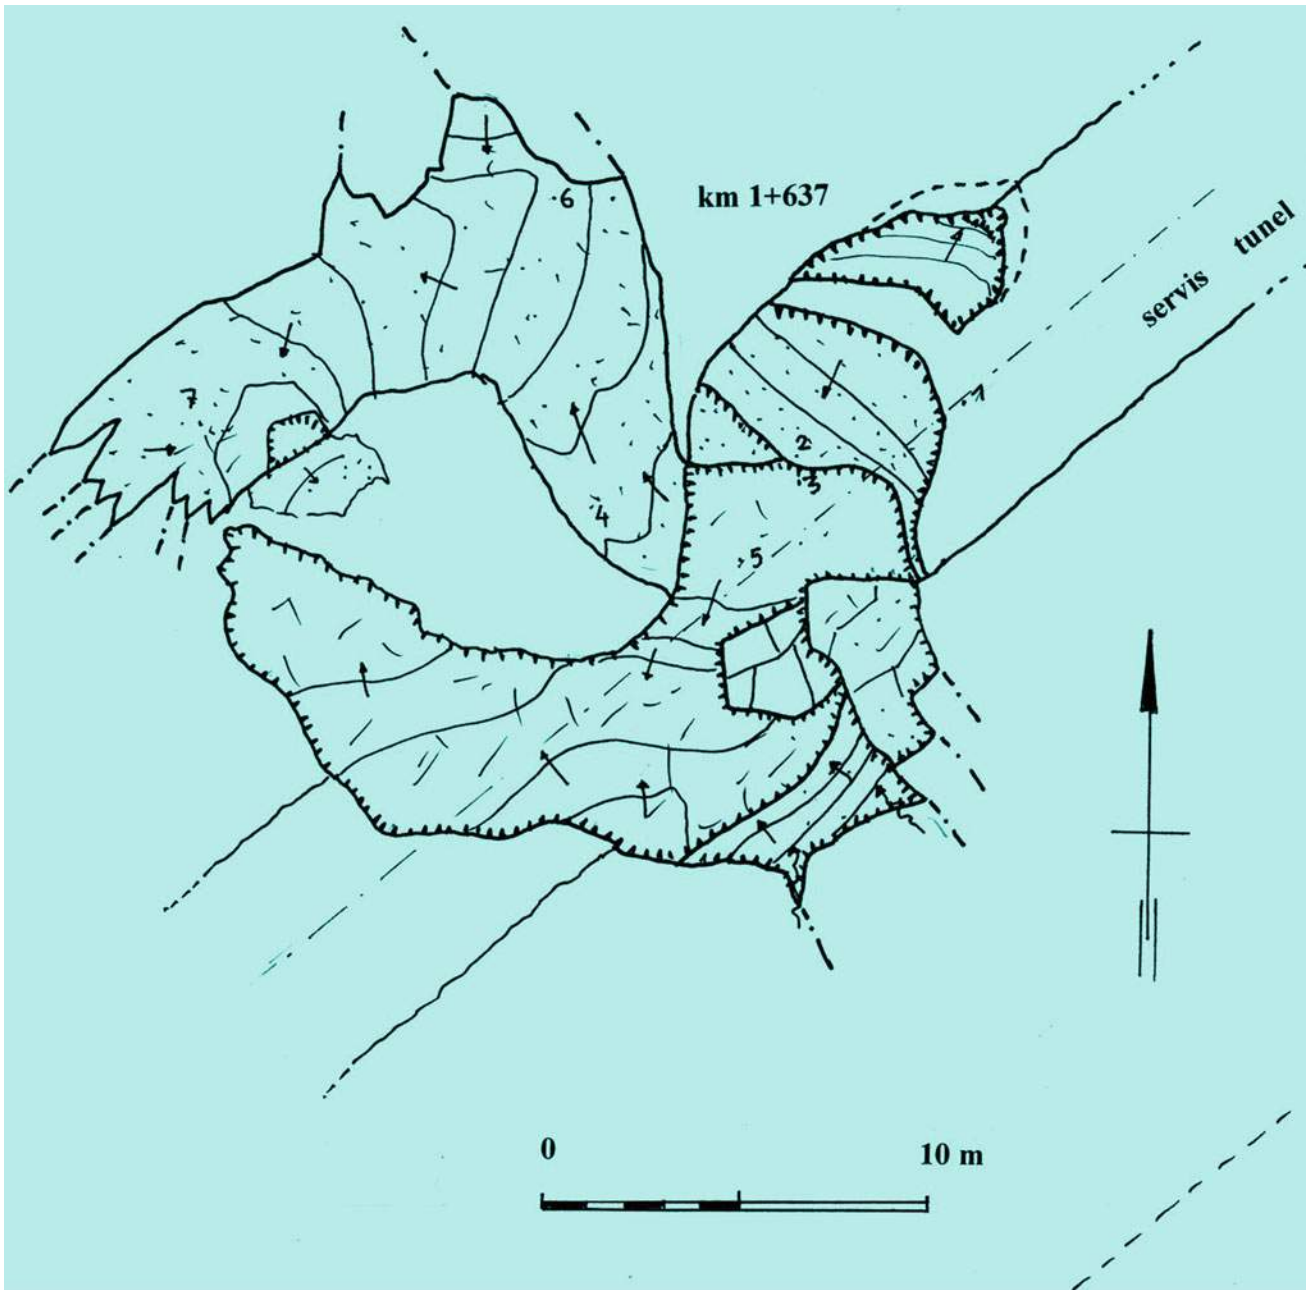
Plan of cavern at km 1 + 637 in Sveti Ilija Tunnel
